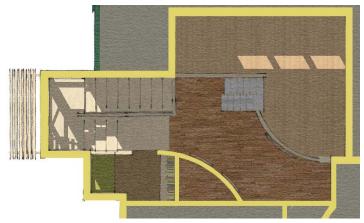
Second Floor Transitional Space - natural light 6/21 at 12 pm
